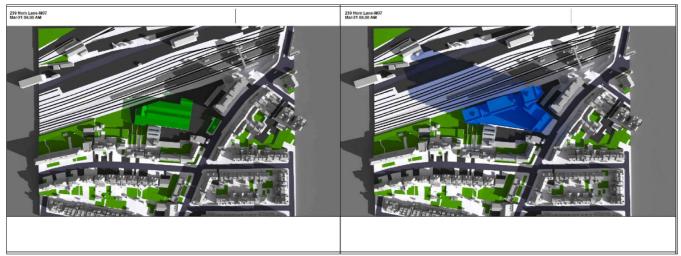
Existing and Proposed Overshadowing (8am, 21 March)
